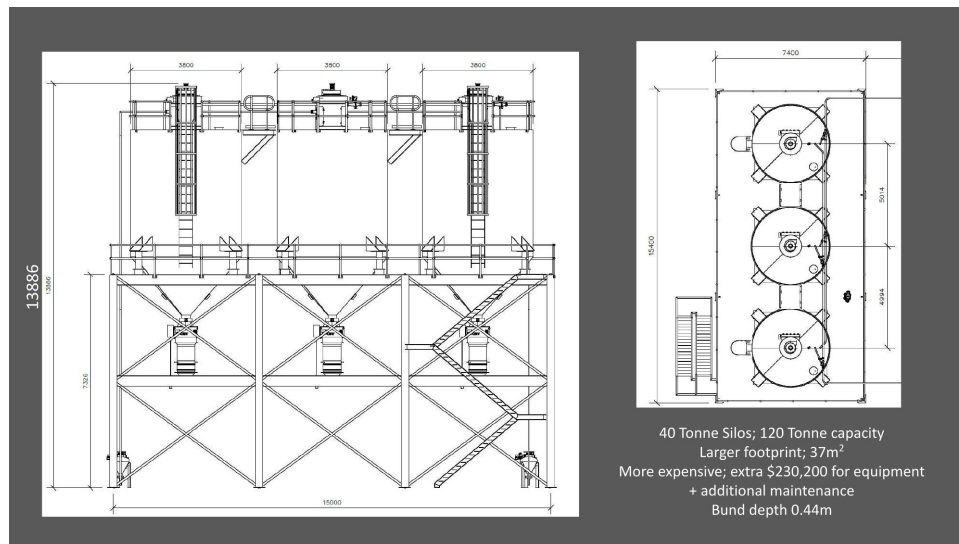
Three 40 tonne silo configuration: elevation and plan, 120 t total capacity, larger footprint, 0.44 m bund depth.
